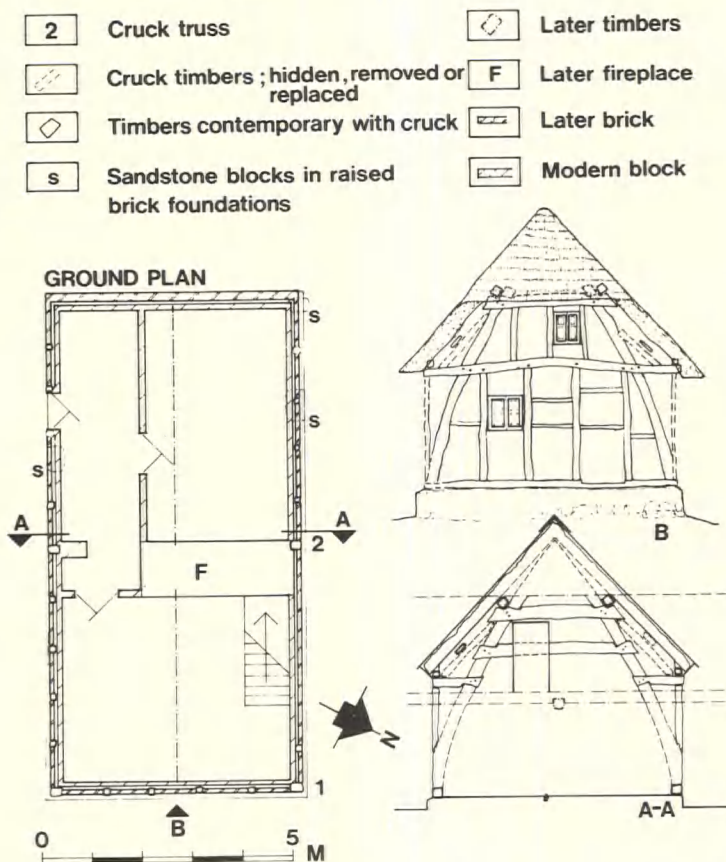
Eggington, Clipstone Cottage cruck frame building. Existing wall studs shown on plan and elevation, are probably not all original but seem to indicate original placings.
